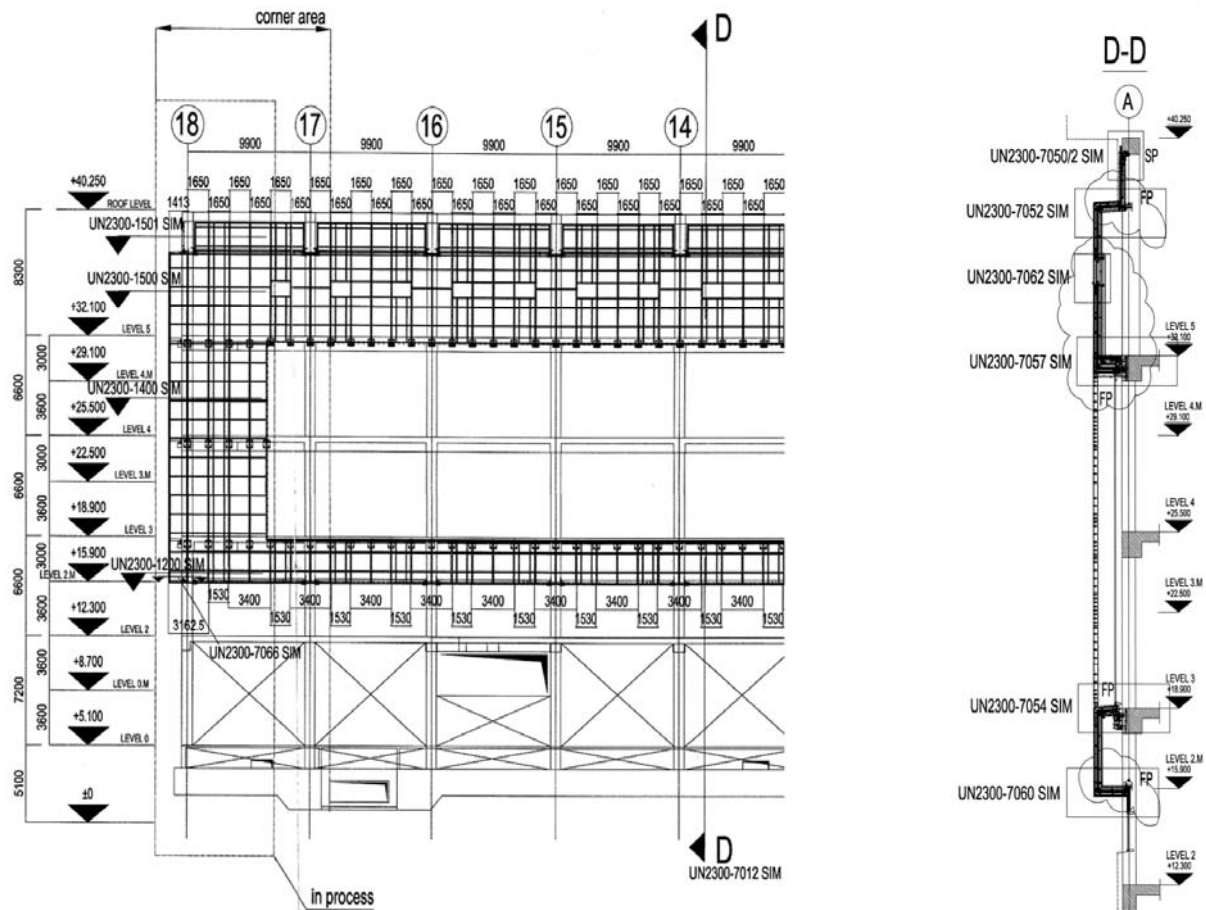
Building Facades Details Using Non- Conventional Pre-Fabricated Steel Framing and Terracotta Tiles .
